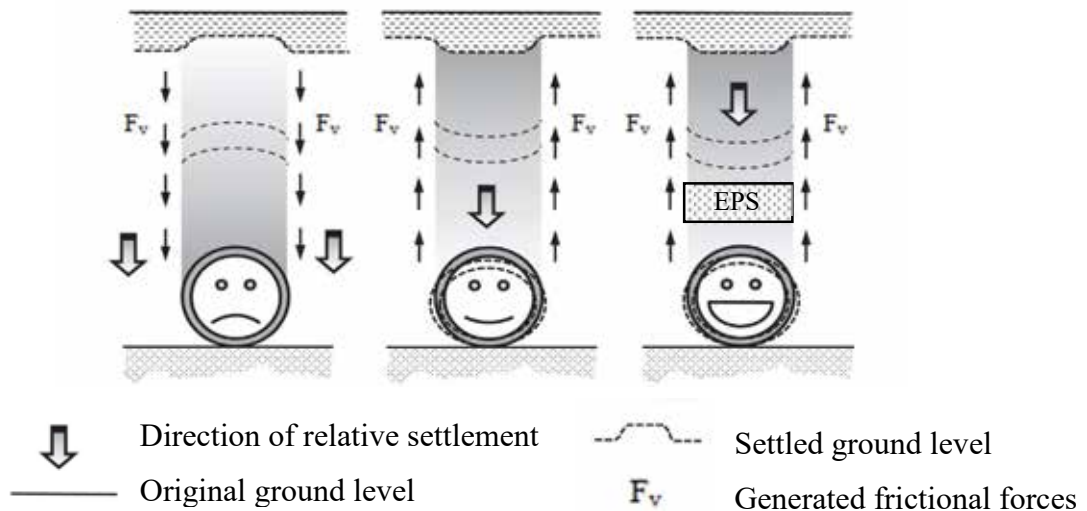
Load transfer within soil-pipe system: (a) rigid pipe in embankment installation, (b) flexible pipe in embankment installation, (c) flexible pipe in imperfect trench installation (Kang, 2019)
